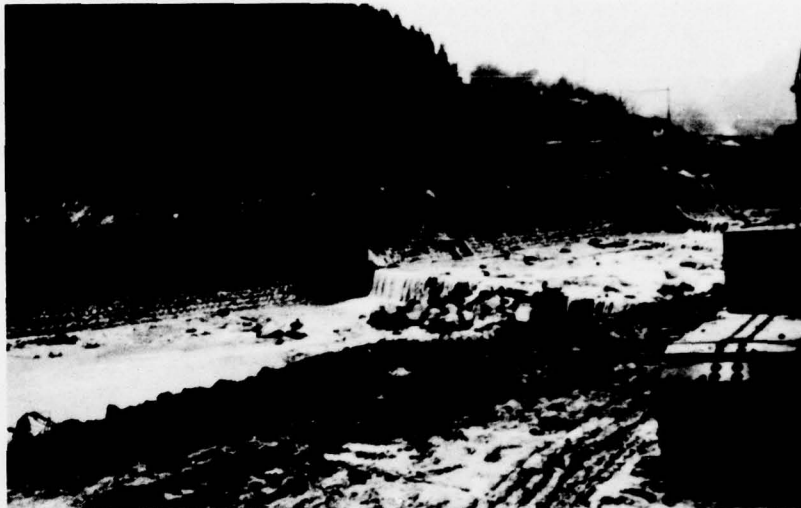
The streambed about 1 km downstream of the tailings dam - after the failure
